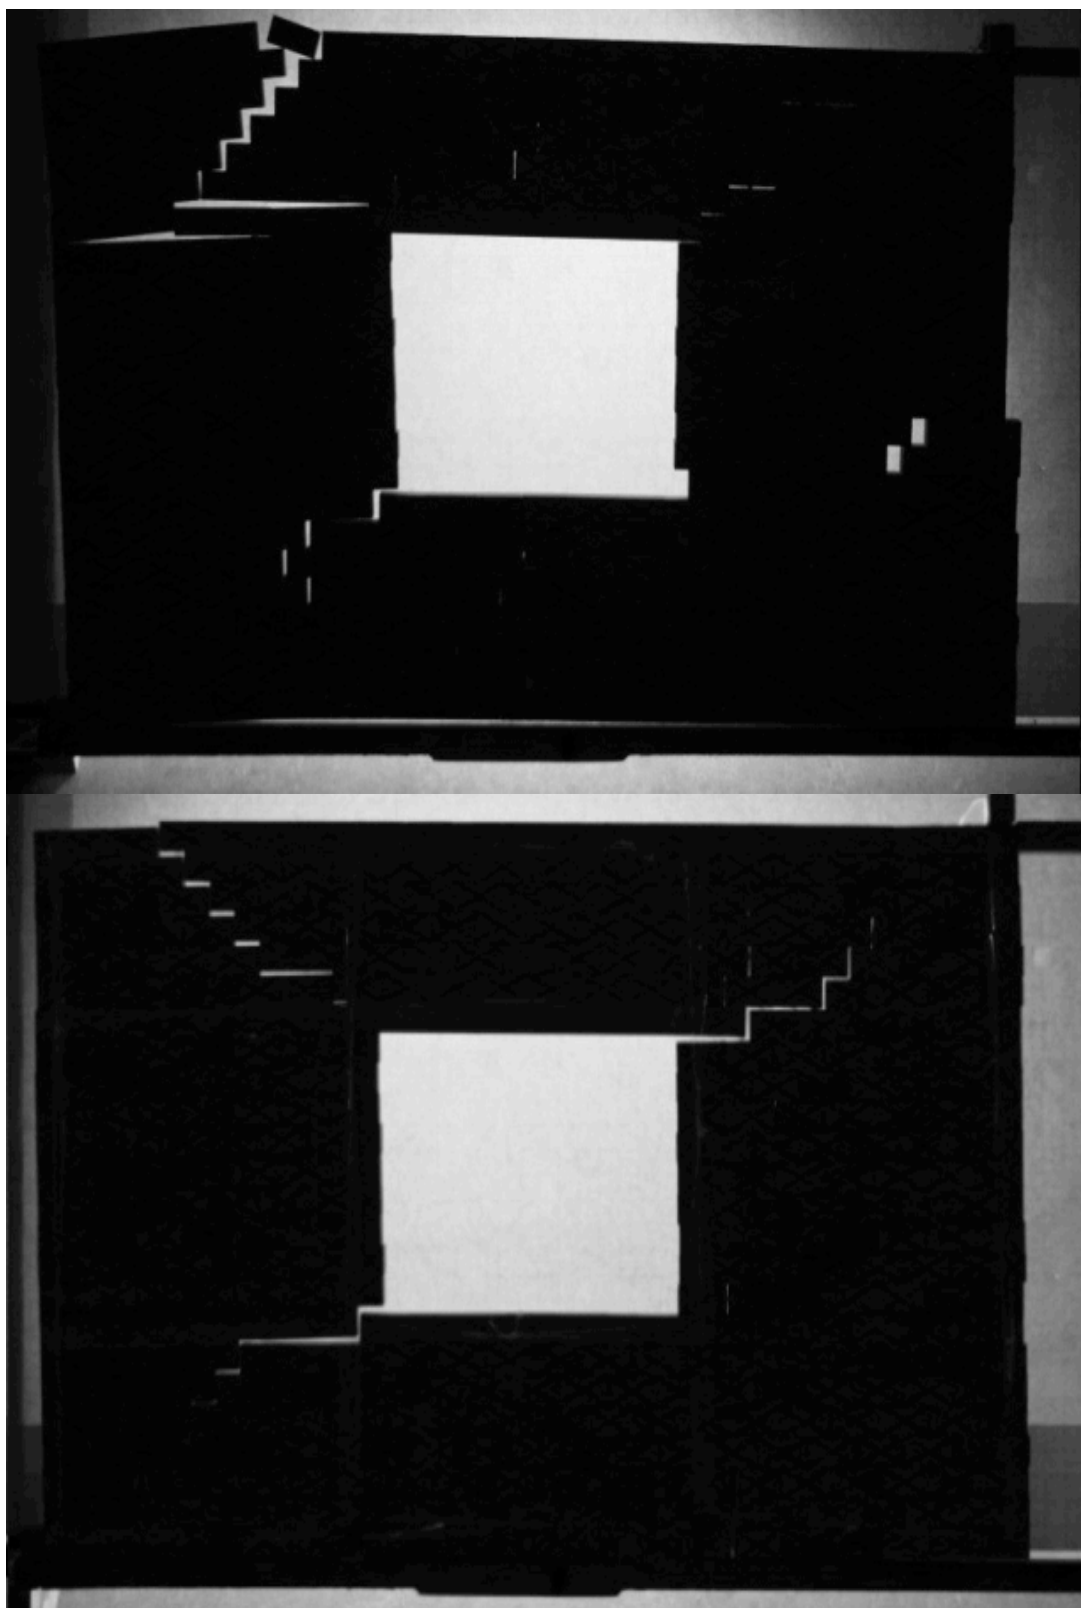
Non-retrofitted (top) and retrofitted (bot.) wall-with-opening at 6mm base displacement (*pictures taken in dark room against a lit background for easy viewing of cracks*)
